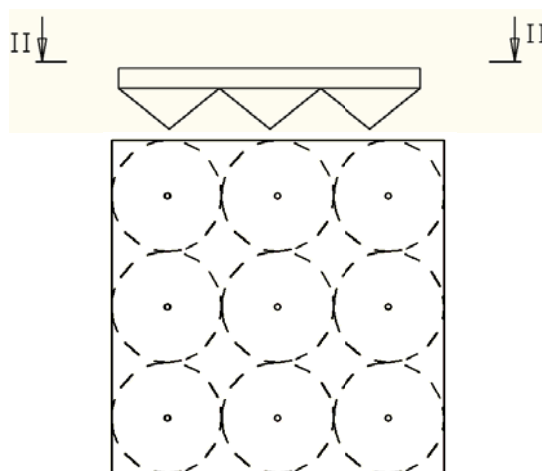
Reinforced concrete plate with a bottom surface of the pointed cone-shaped elements
